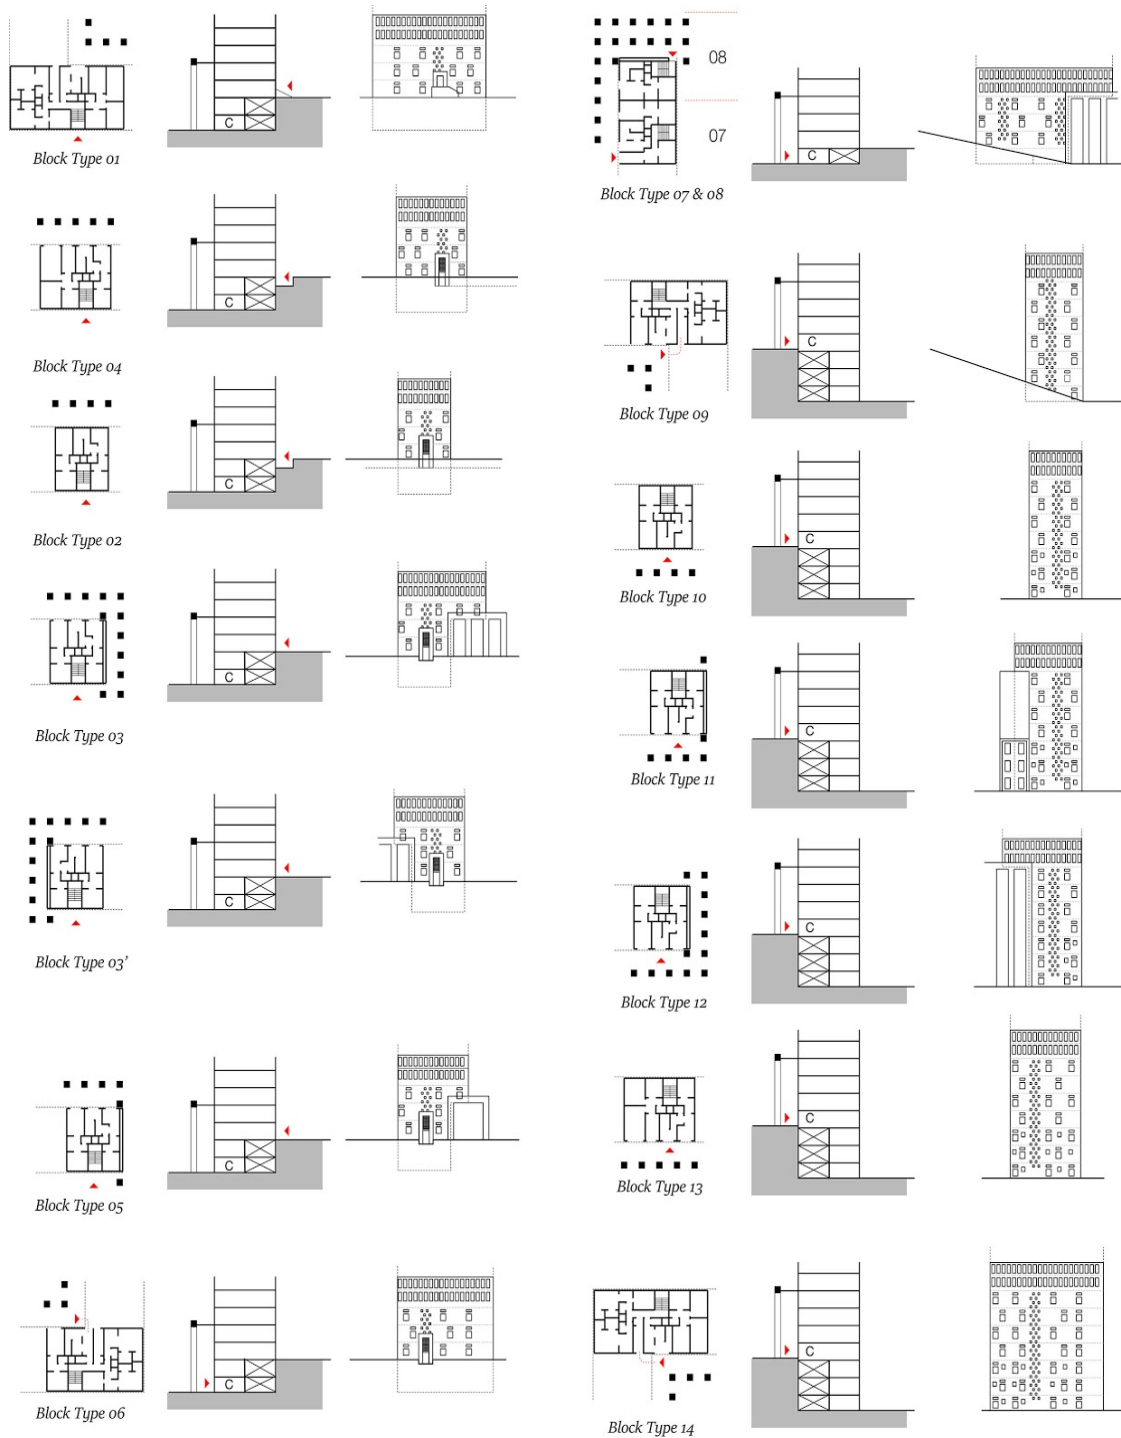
The plan, section and elevation of different block types in the 200 Colonnes.
